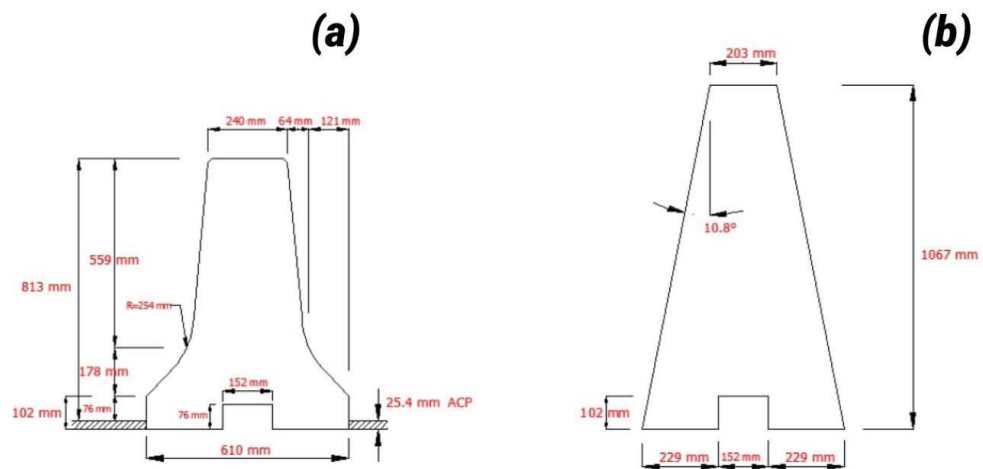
a) F-shape concrete safety barrier, b) Single-slope concrete barrier [114].
